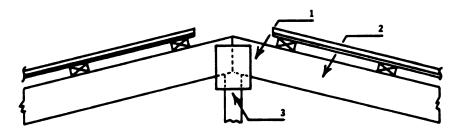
Location of test sites, Barn B. Truss No. 1, 40.7m (134') from south end. North elevation. Flashing, bird netting not shown.
